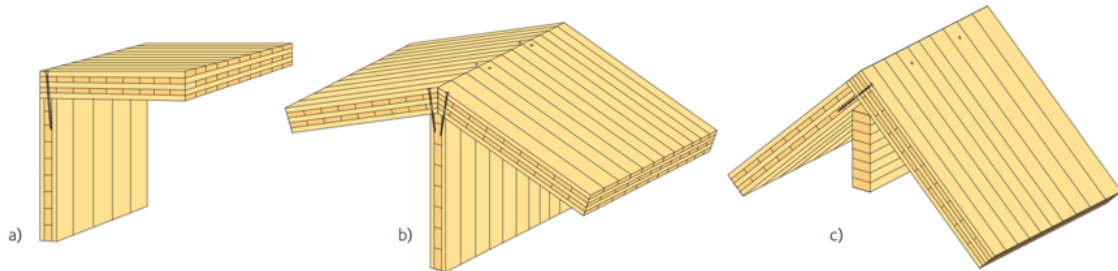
W2R joint: Screw. (Swedish Wood, 2019).
